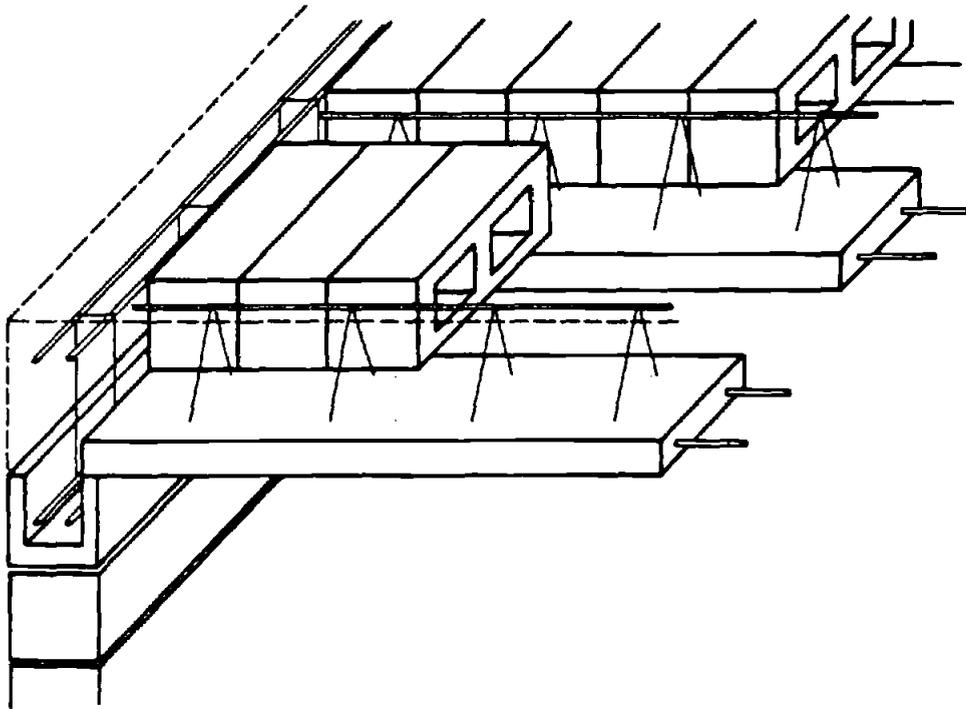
Concrete block, precast concrete, and poured-in-place concrete roof system.
